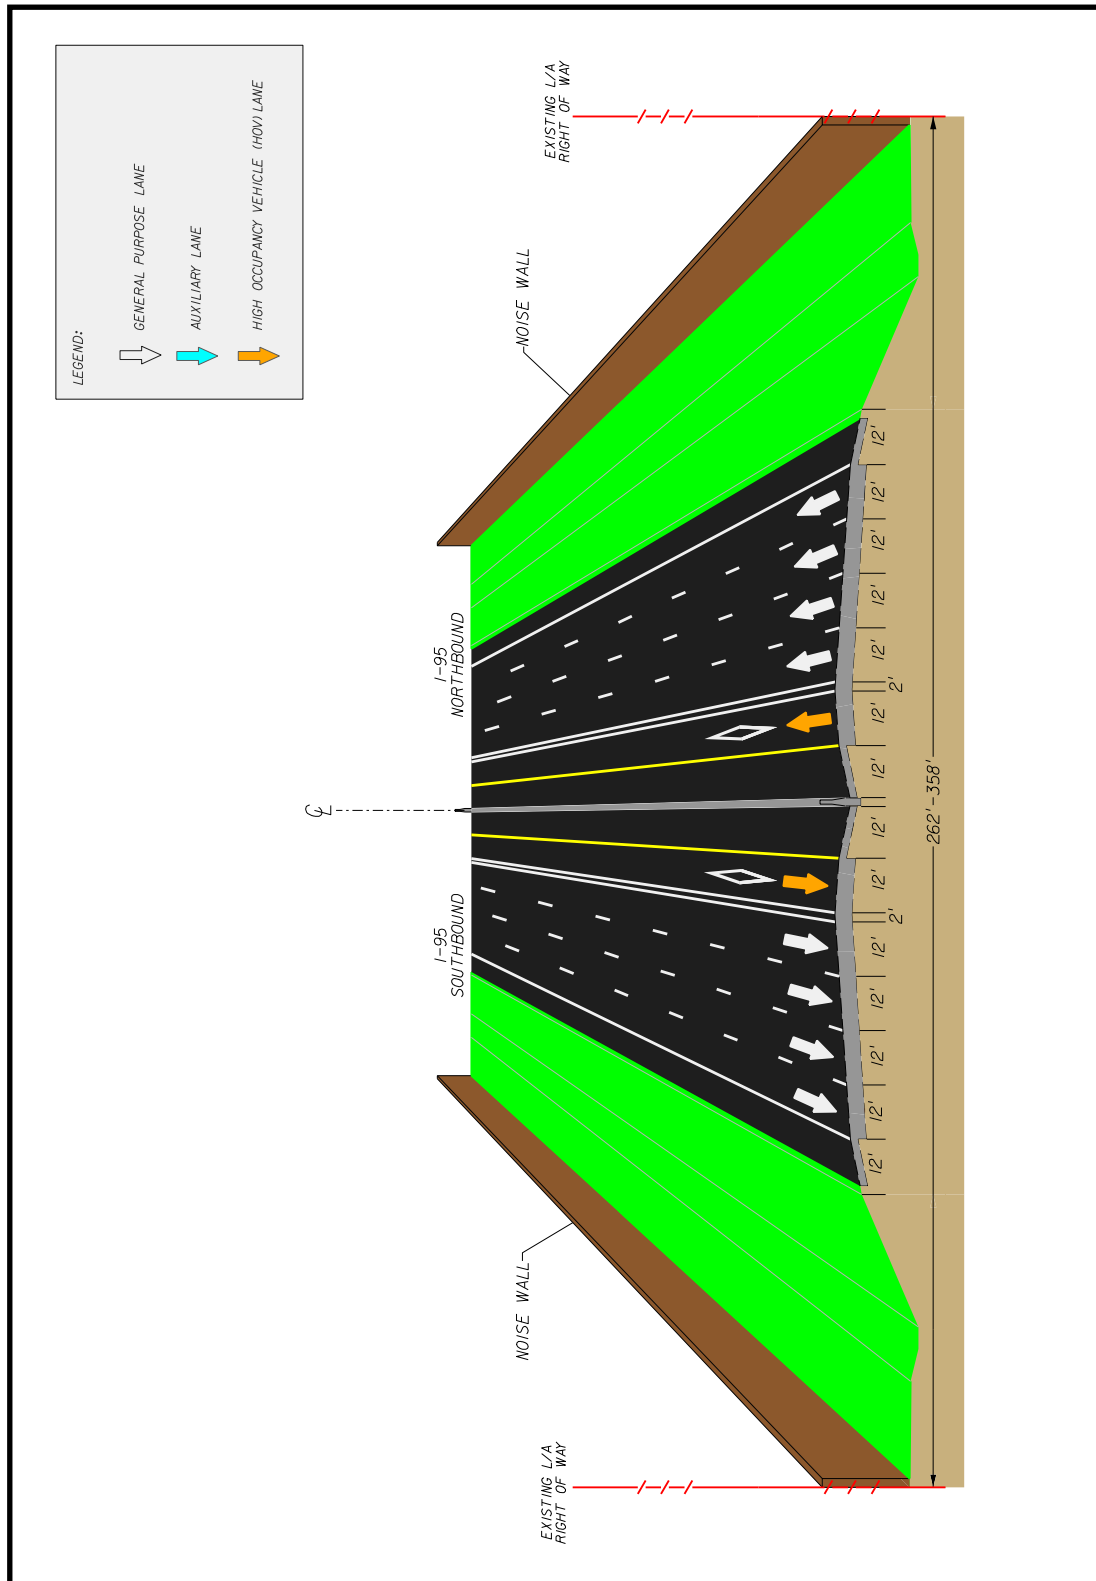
No-Build Alternative Typical Section between Oakland Park Boulevard and Commercial Boulevard
